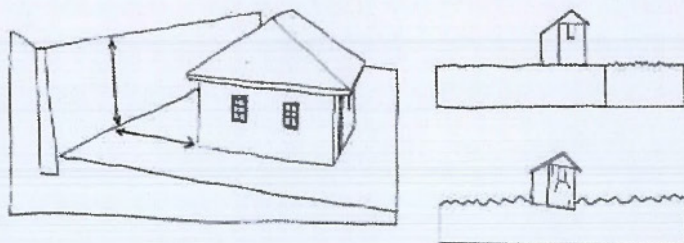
If building near a slope position house a minimum of 4ft from the slope and provide a retaining wall if necessary.
